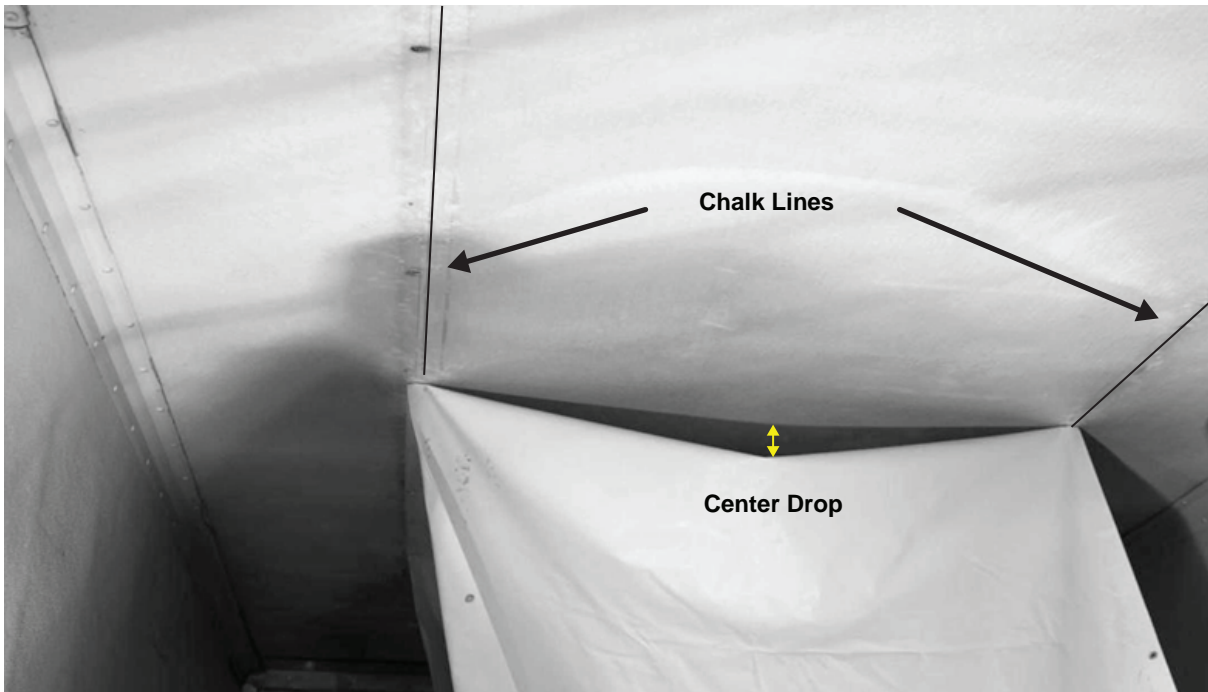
Chute slack in front of air outlet should be 1.00 in. to 2.00 in.
